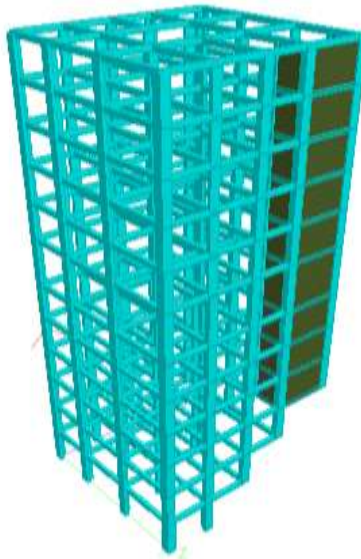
Isometric view of Hostel no. 05 with Shear Walls
